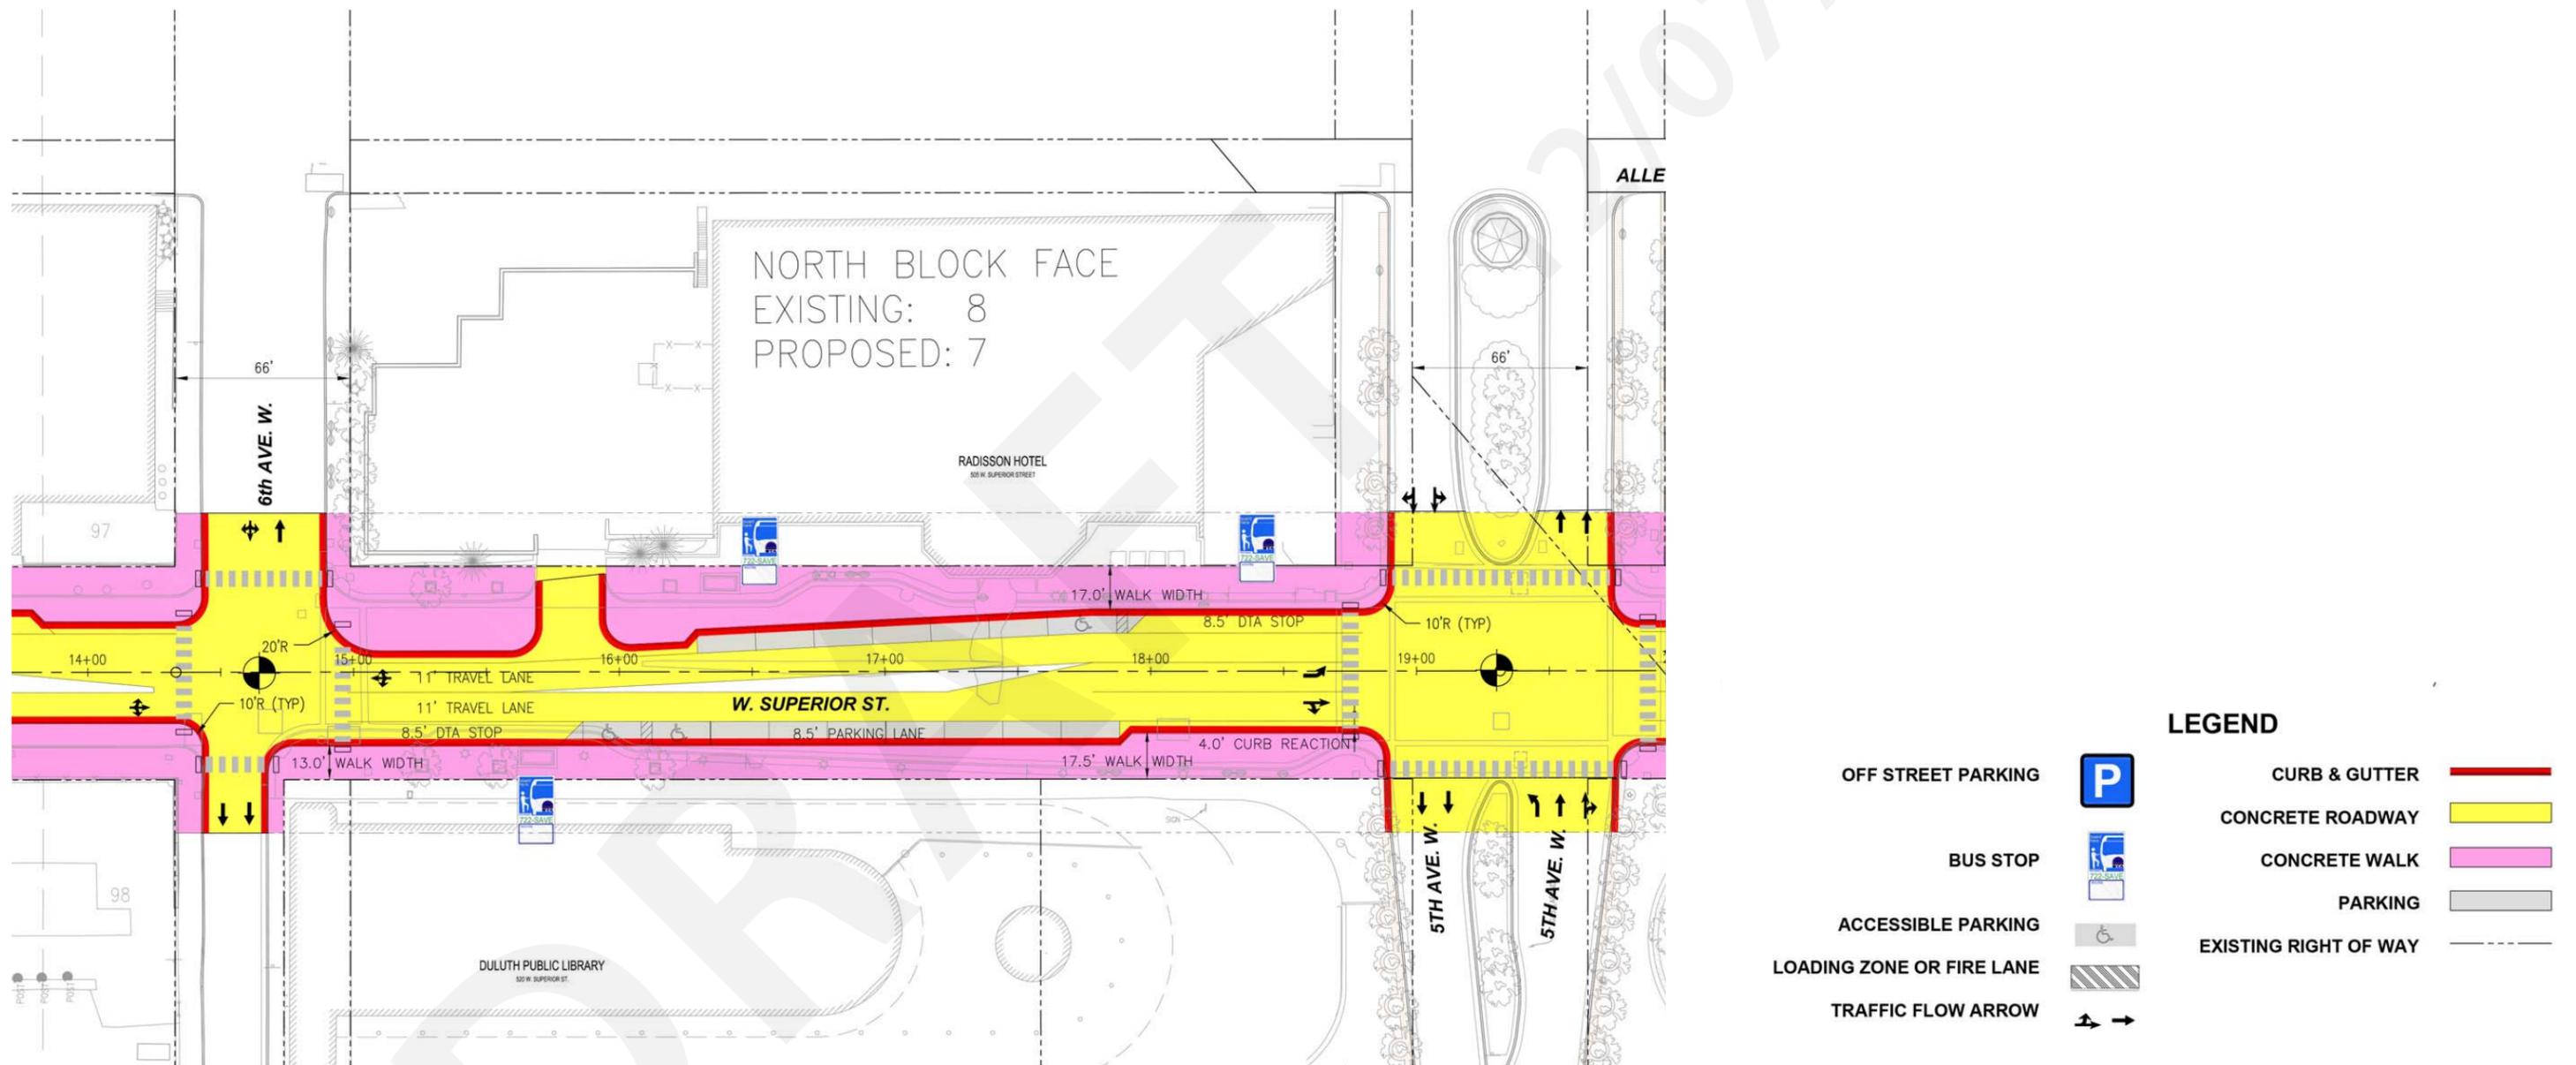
Proposed street layout between 6th Ave West and 5th Avenue West.
